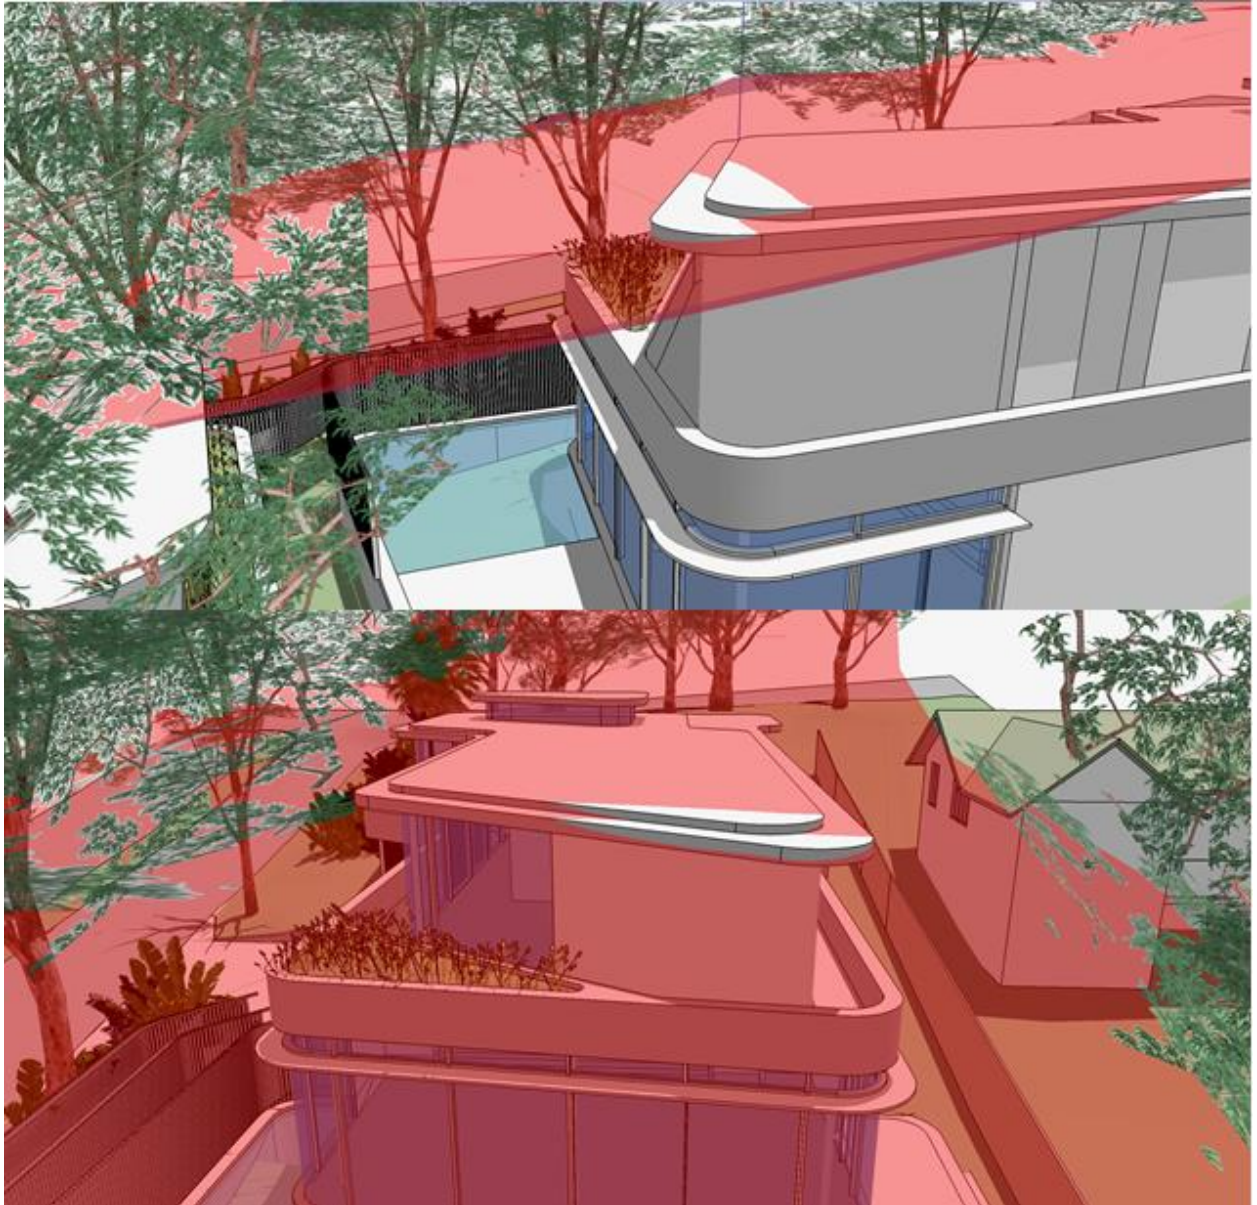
3D height planes detailing compliance with Clause 40(4)(a)
